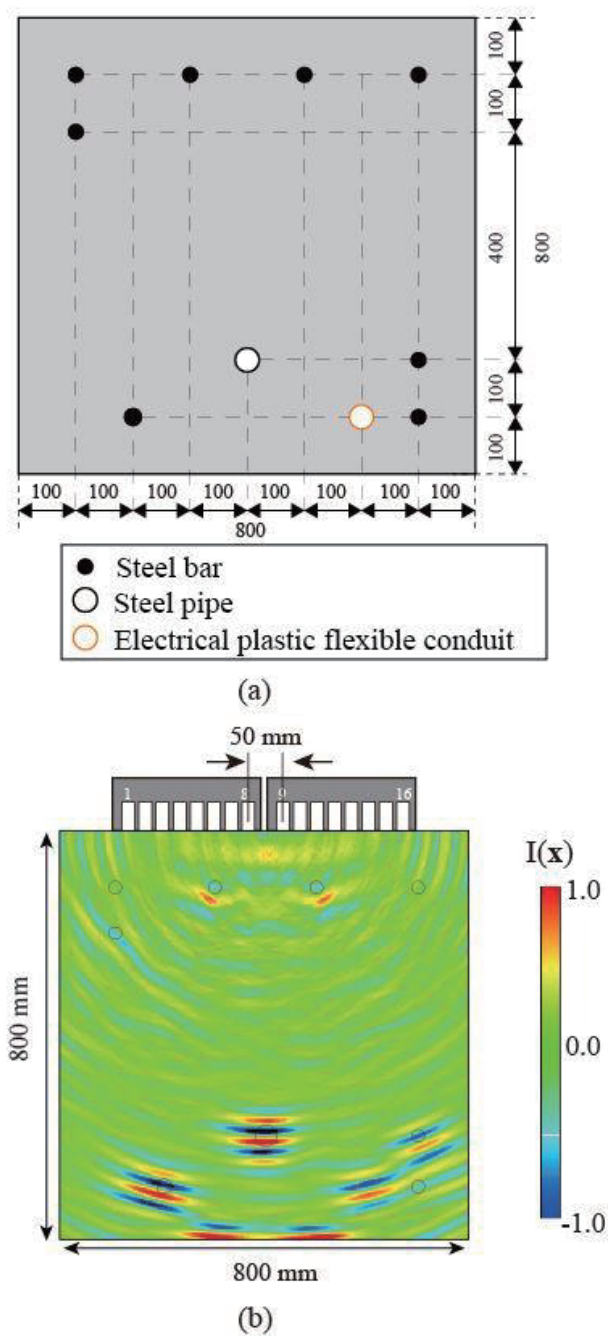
(a) Concrete specimen and (b) Images of steel pipe, steel bar, and plastic flexible conduit.
